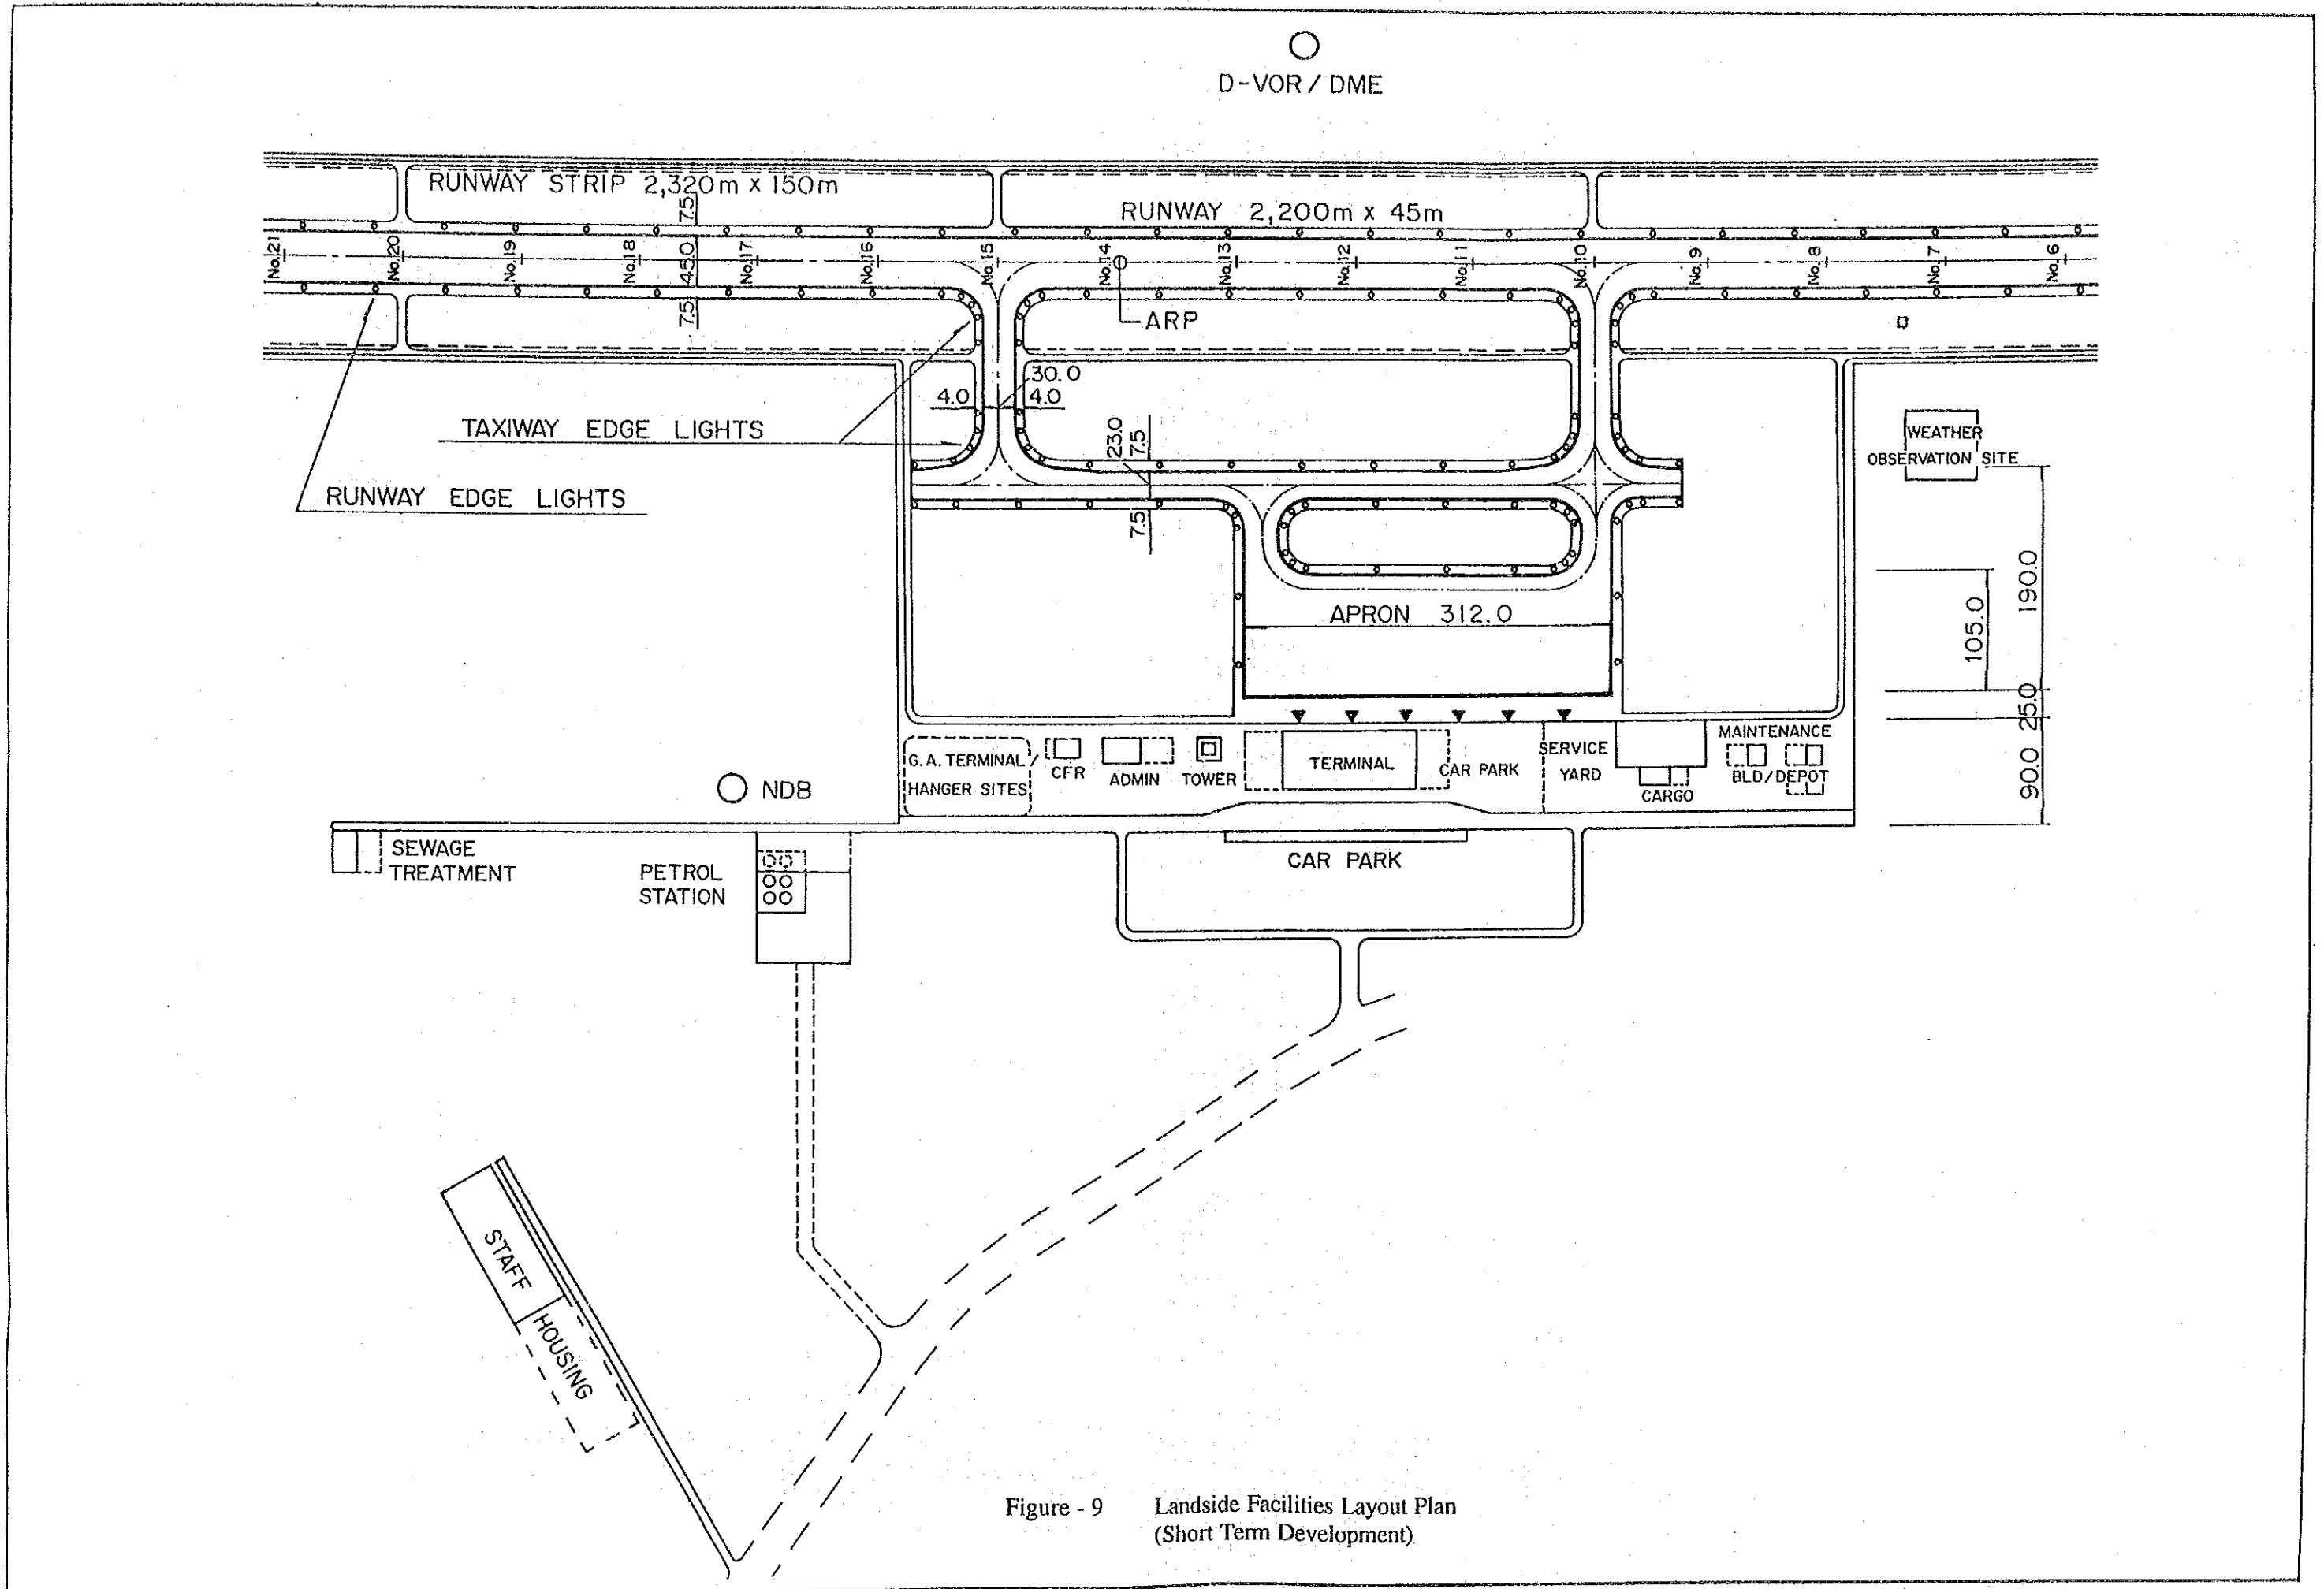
Landside Facilities Layout Plan (Short Term Development)
